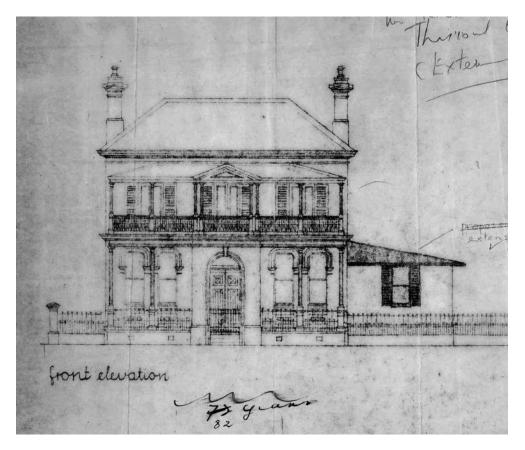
Elevation drawing of the Bank branch showing a later, 1920s (?) addition to the side.
